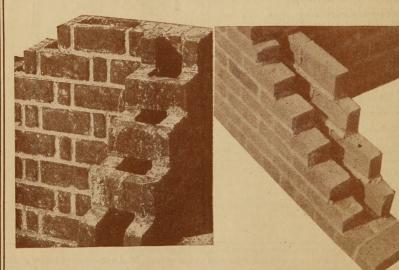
" Ideal all-rolok wall. Note its attractive appearance and sturdy construction.
